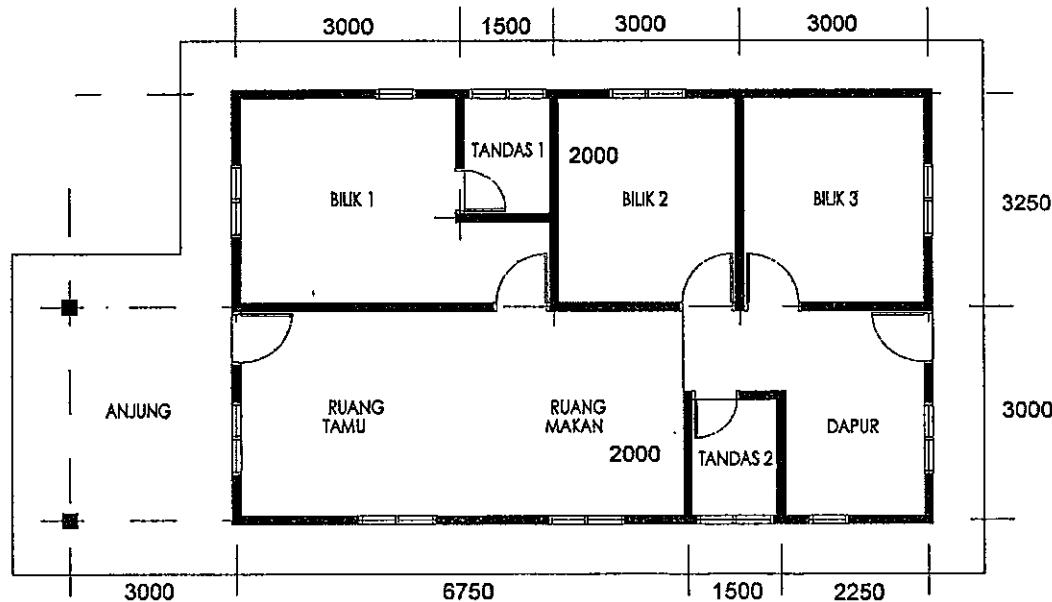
(c) / Rajah B1 (c): Floor Plan / Pelan lantai
